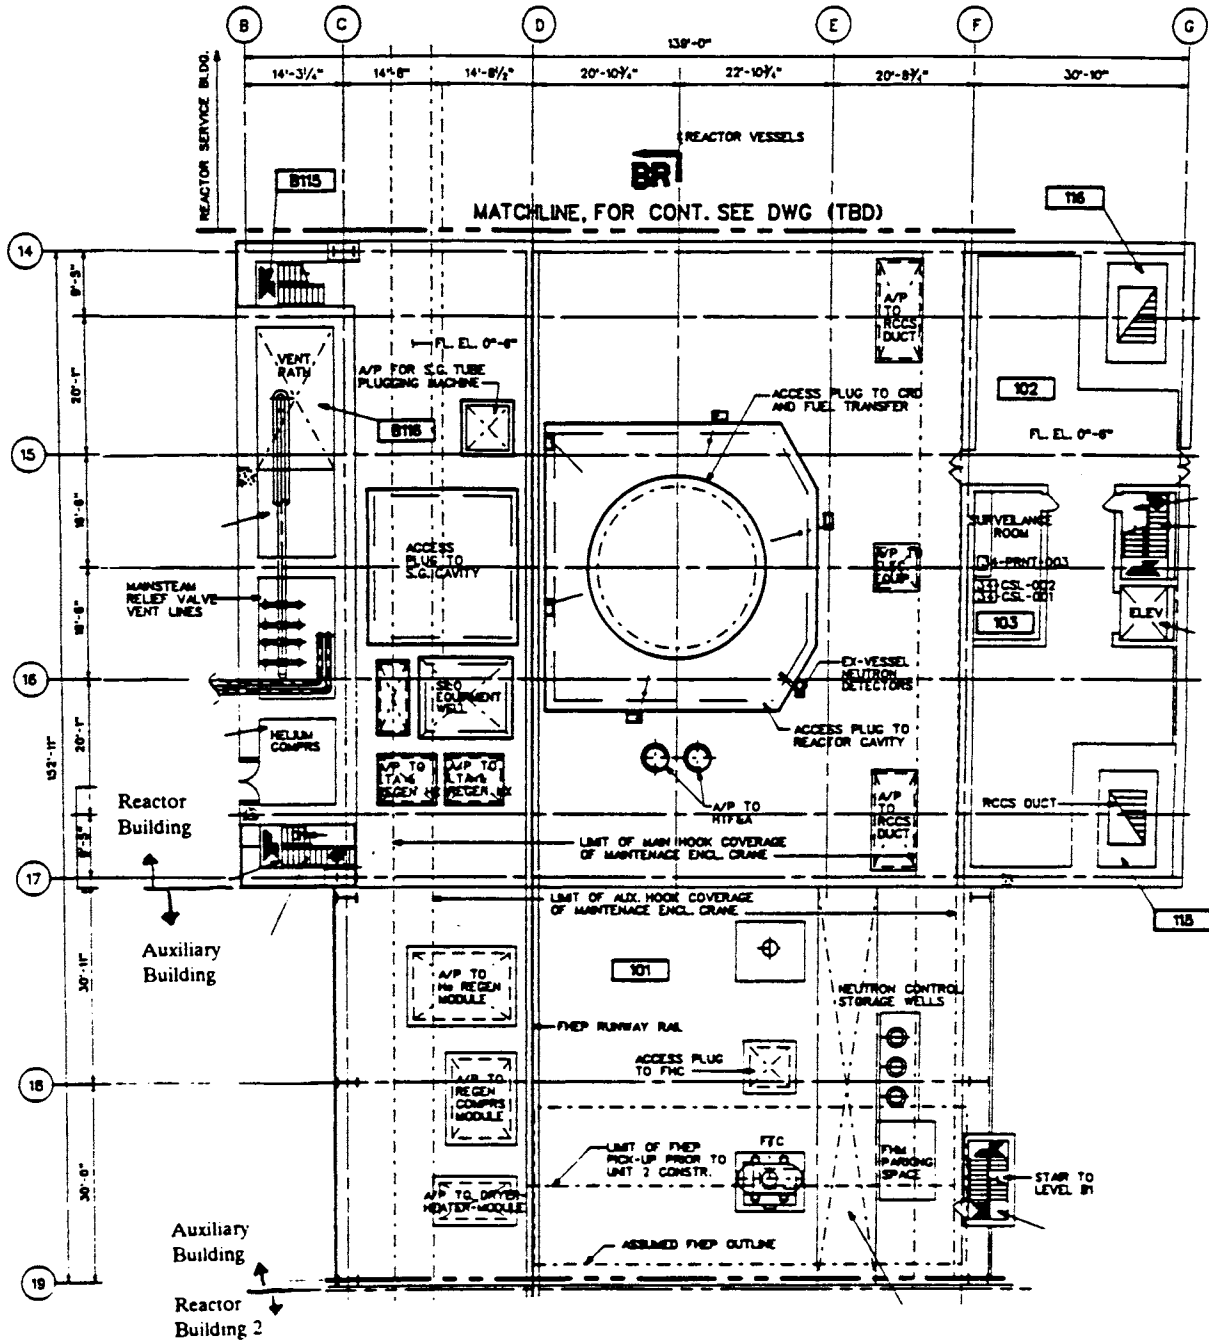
REACTOR BUILDING - PLAN AT GRADE
